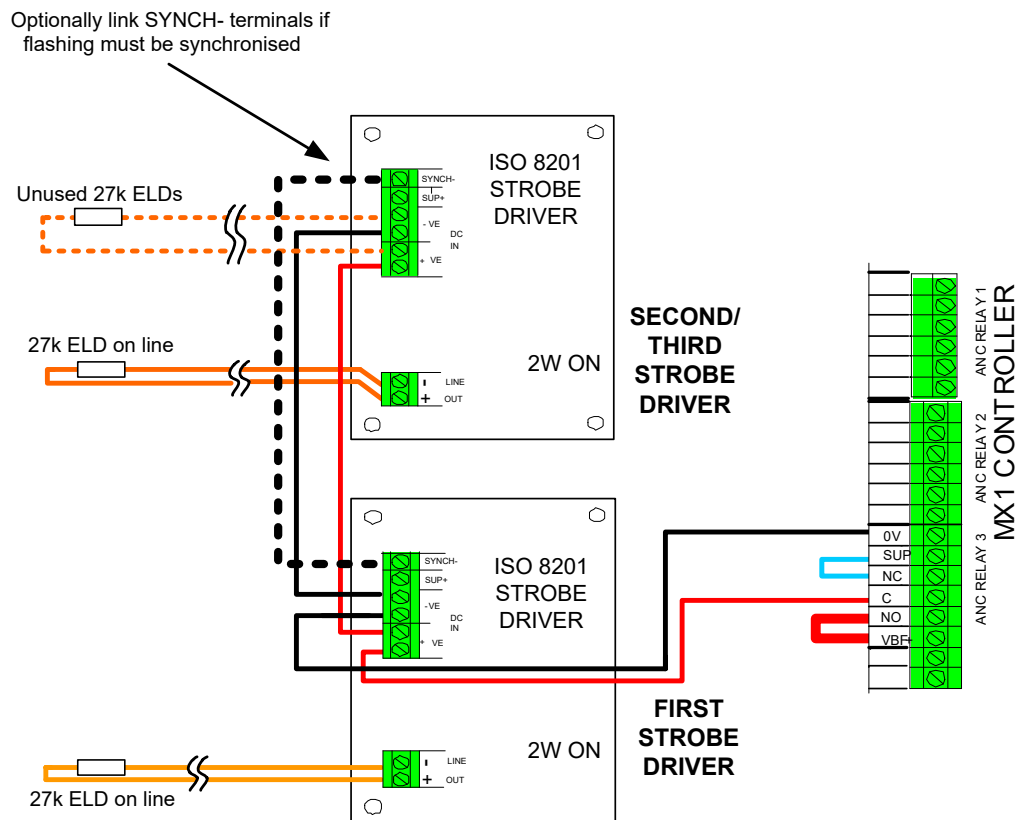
ISO 8201 Strobe Driver Wiring Details
